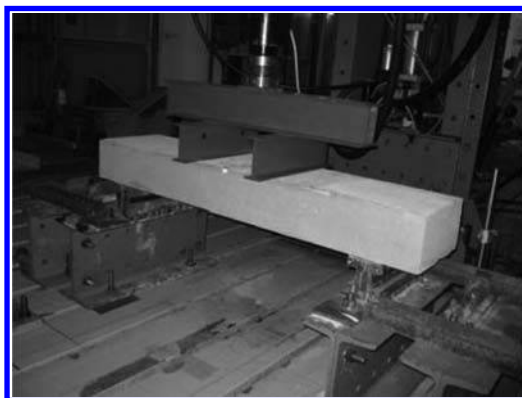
The arrangement of experiments with reinforced concrete specimens.
